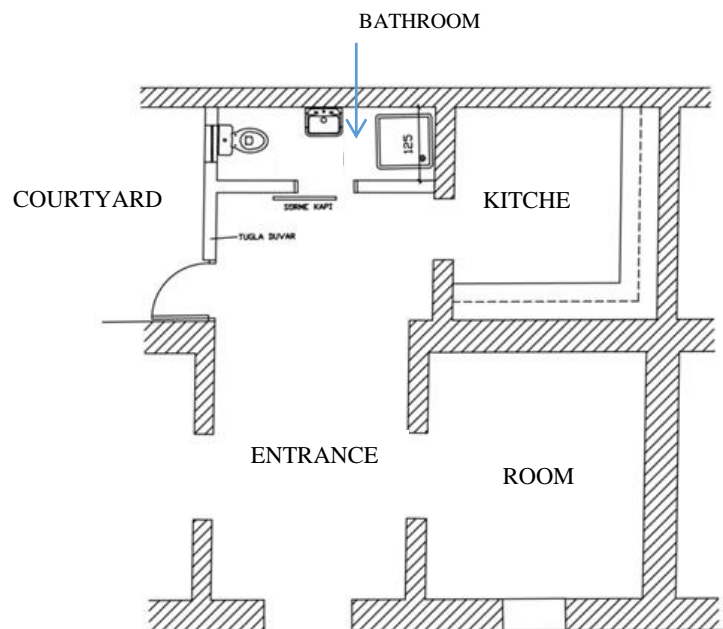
Bathroom and toilet area detached from the kitchen in typical residential plan (EVKAF, 2004)
